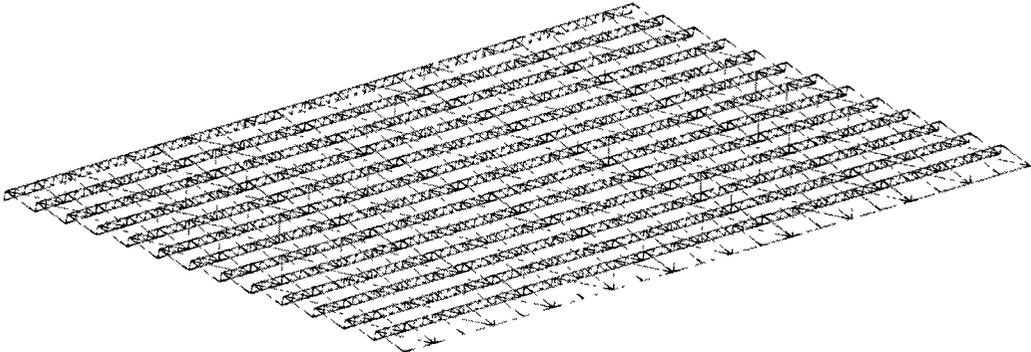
Reconstructed roof structure for greenhouse. Author.
